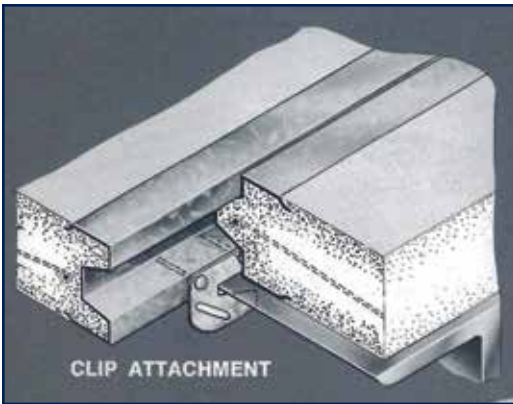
Attachment of panels to the support framing may be by purlin clips. (Image courtesy of U.S. Gypsum.)
